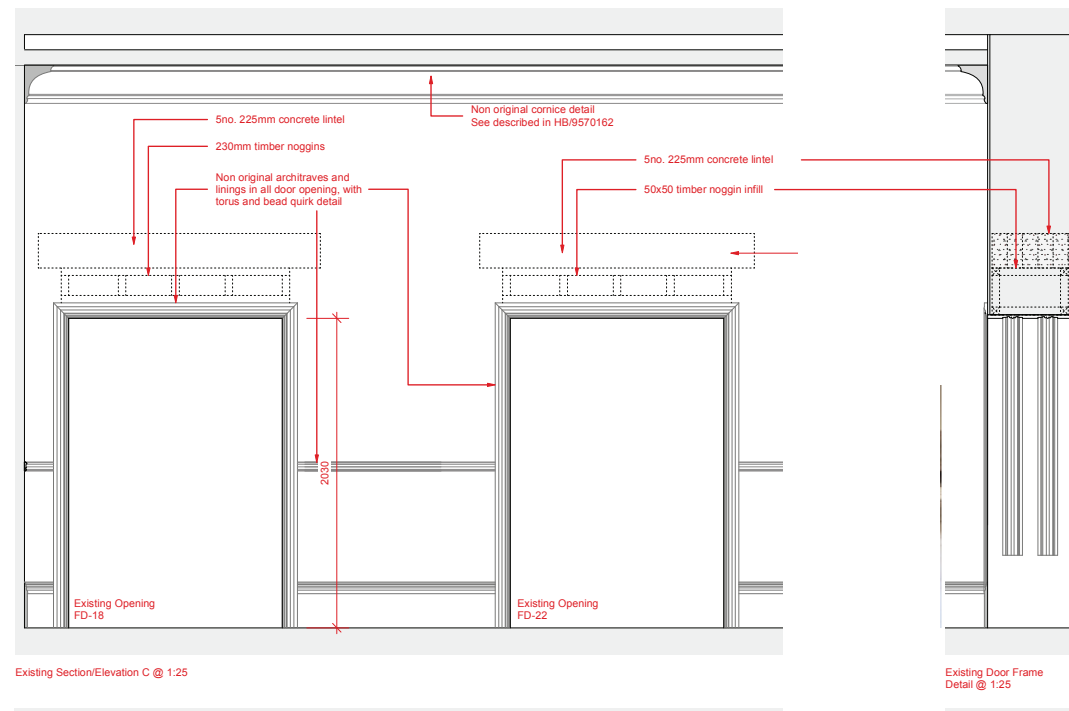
Existing Elevation C - Flat 2, 5 Cambridge Gate
